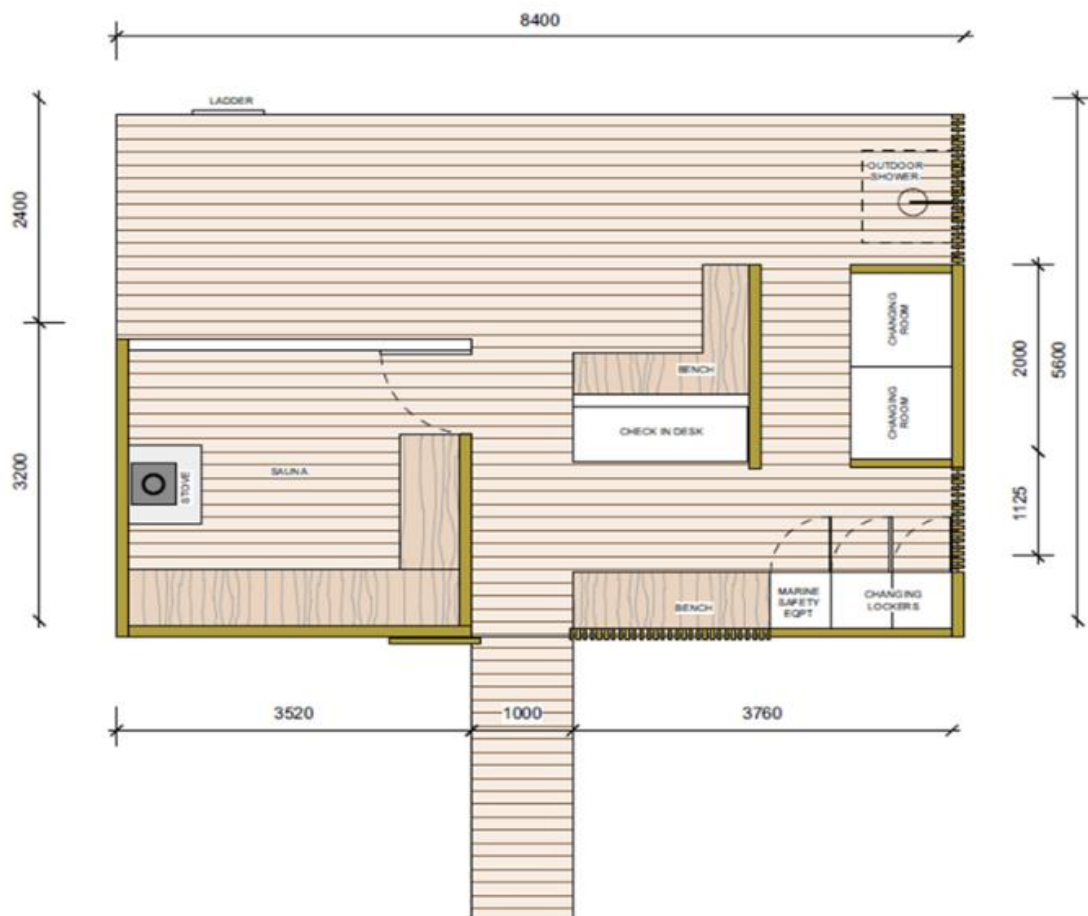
Example 1 of proposed floor plan for floating sauna building. (Source: NCA)
